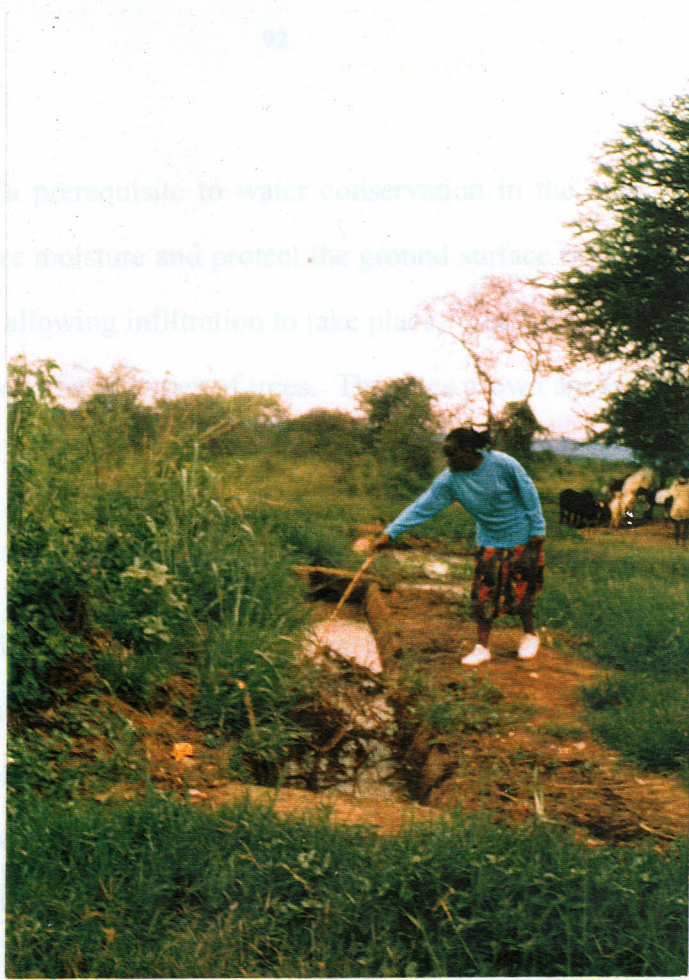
A section of the Ndalani canal with tree branches and waste paper.
